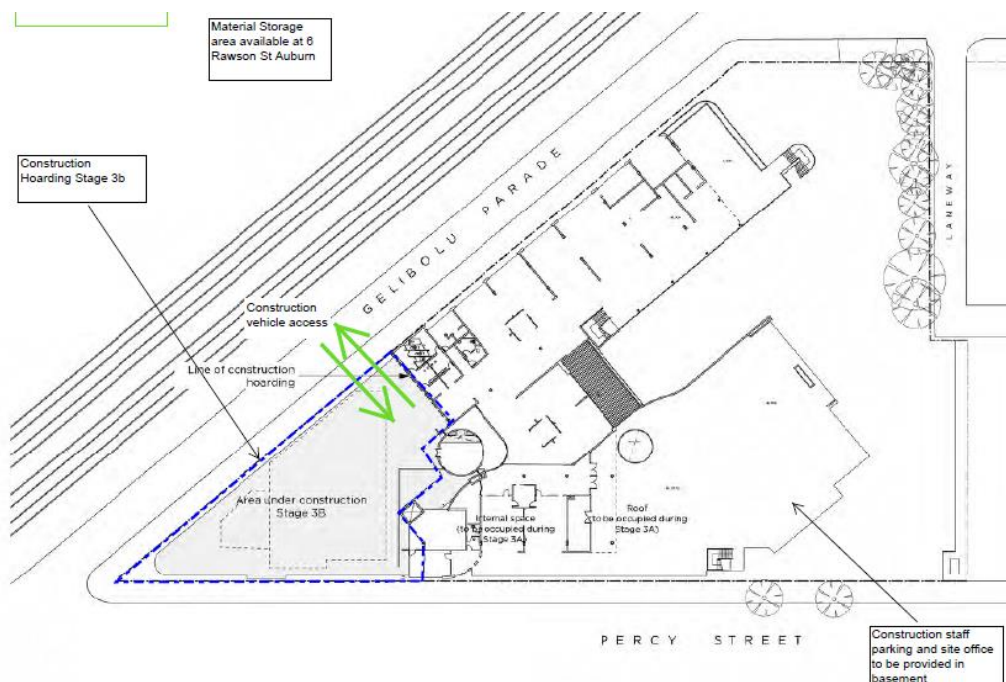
Stage 3B construction works plan – construction of permanent secondary school building
